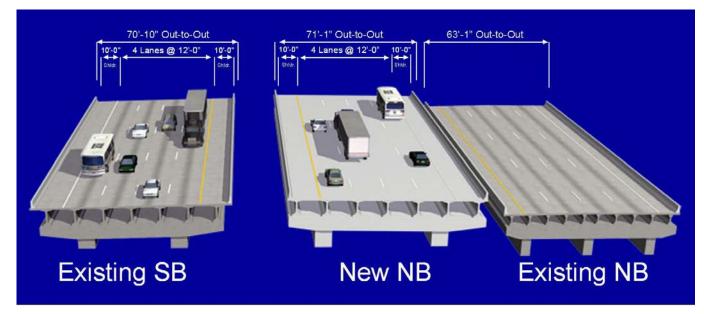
Original Proposed Typical Section for the Replacement Bridge Structure
